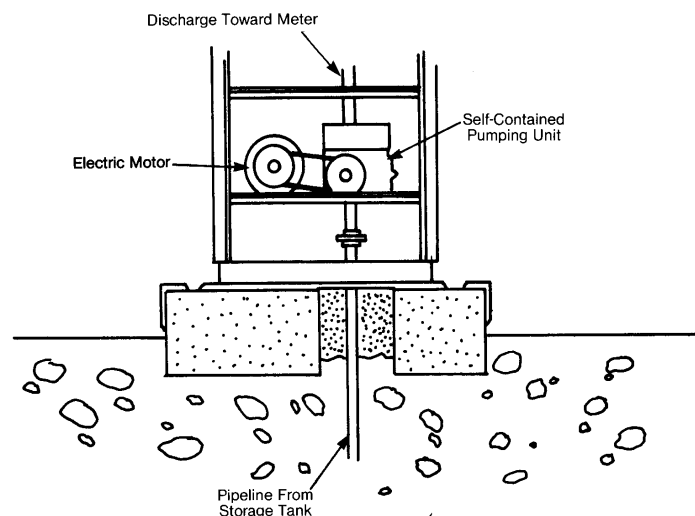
SELF-CONTAINED PUMPING UNIT AND MOTOR
